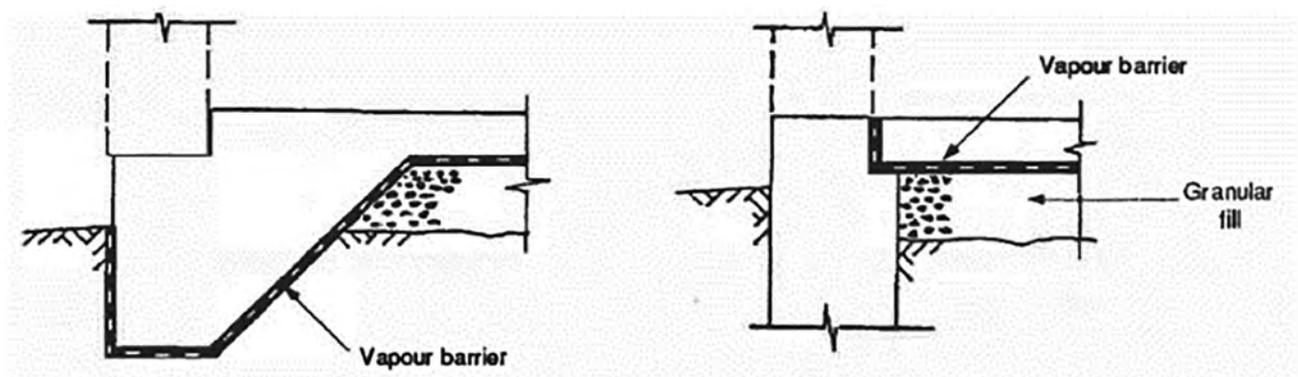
EDGE THICKENING OF CONCRETE SLAB-ON-GROUND FLOORS
